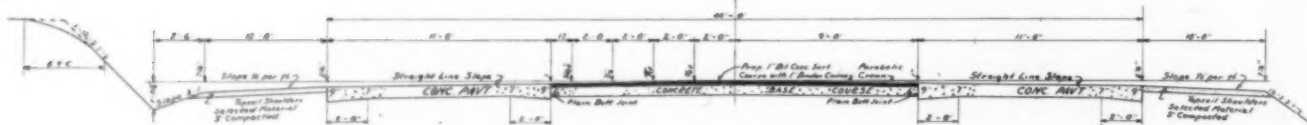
Concrete Base Course and Extra Lanes as Widening on Relocated Sections
